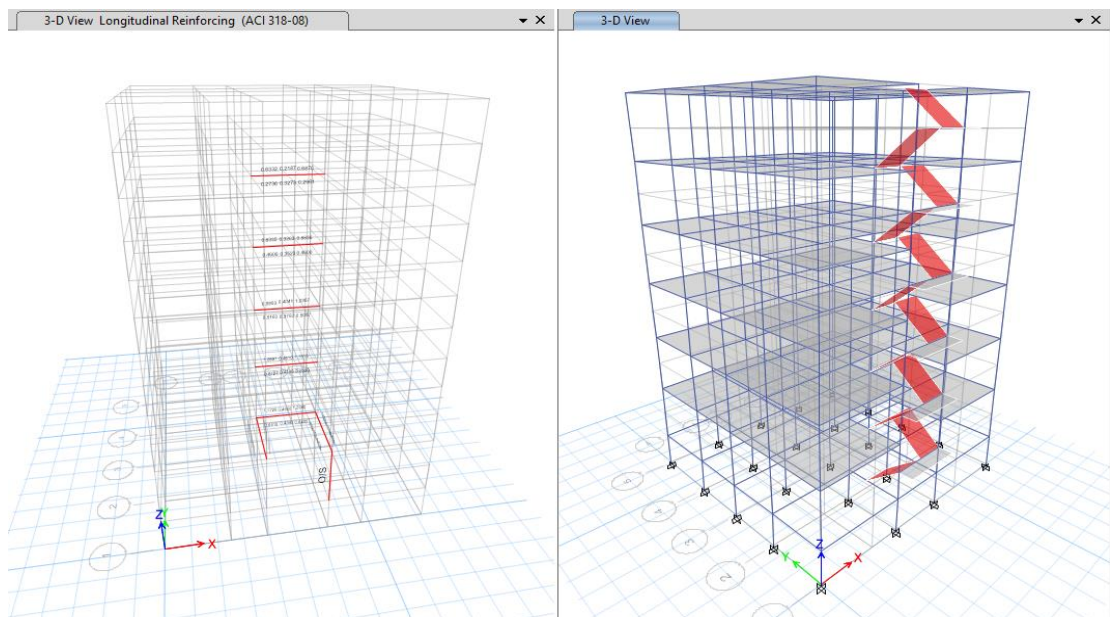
(G+10) story Residential Building with several beams and column failure in Rangpur district in zone 3
